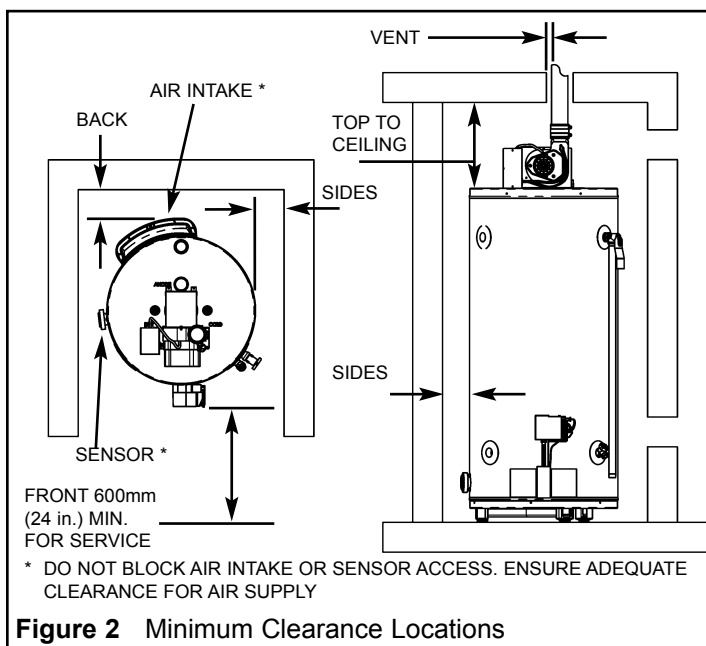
may be used as a reference guide to locate the specific clearance locations. A minimum of 600mm (24 in.) of front clearance and 100mm (4 in.) on each side should be provided for inspection and service.
